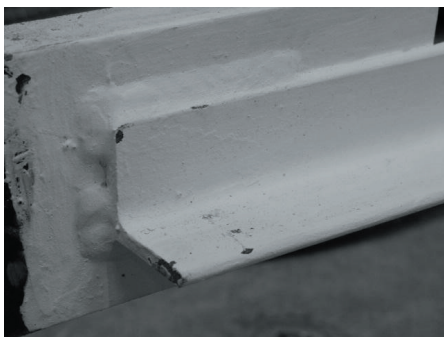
Welded connection between gusset plate and angle member with balanced welds.
